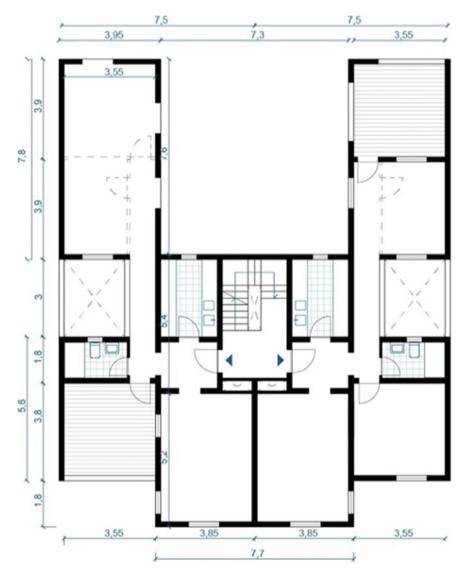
Typology 3 standard floor plan. Source elaboration of the authors
